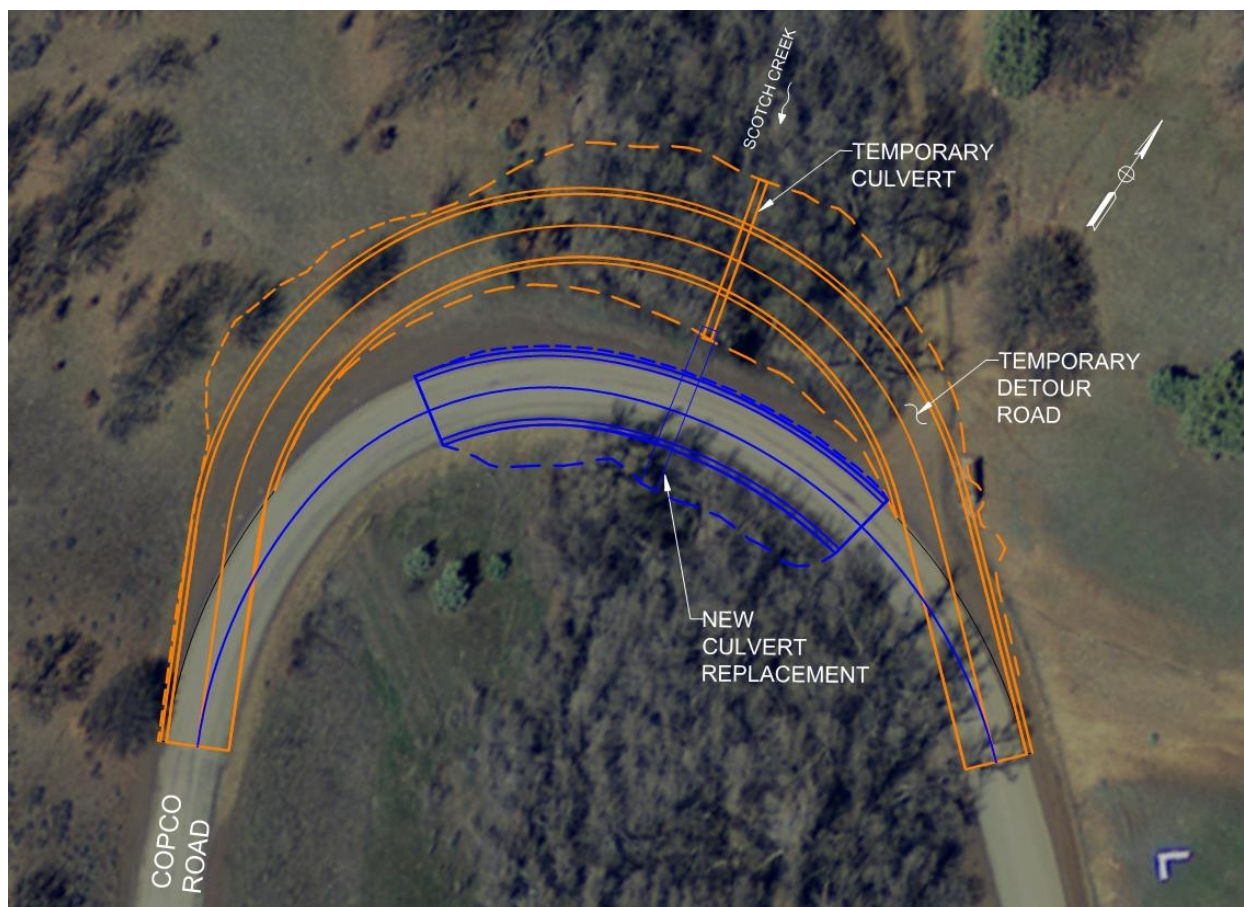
Temporary Culvert and Detour Road at Scotch Creek
